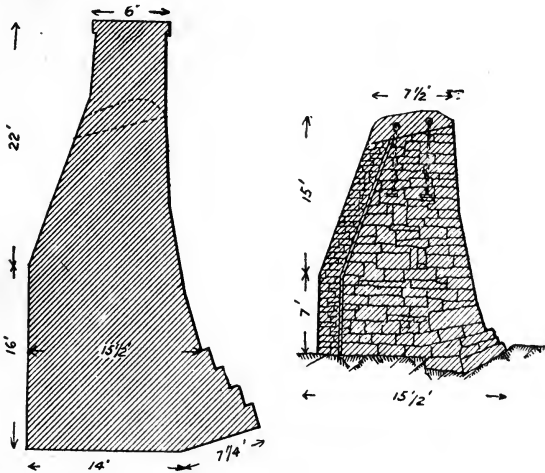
CROSS-SECTIONS OF NEWARK DAM AND WEIR.
